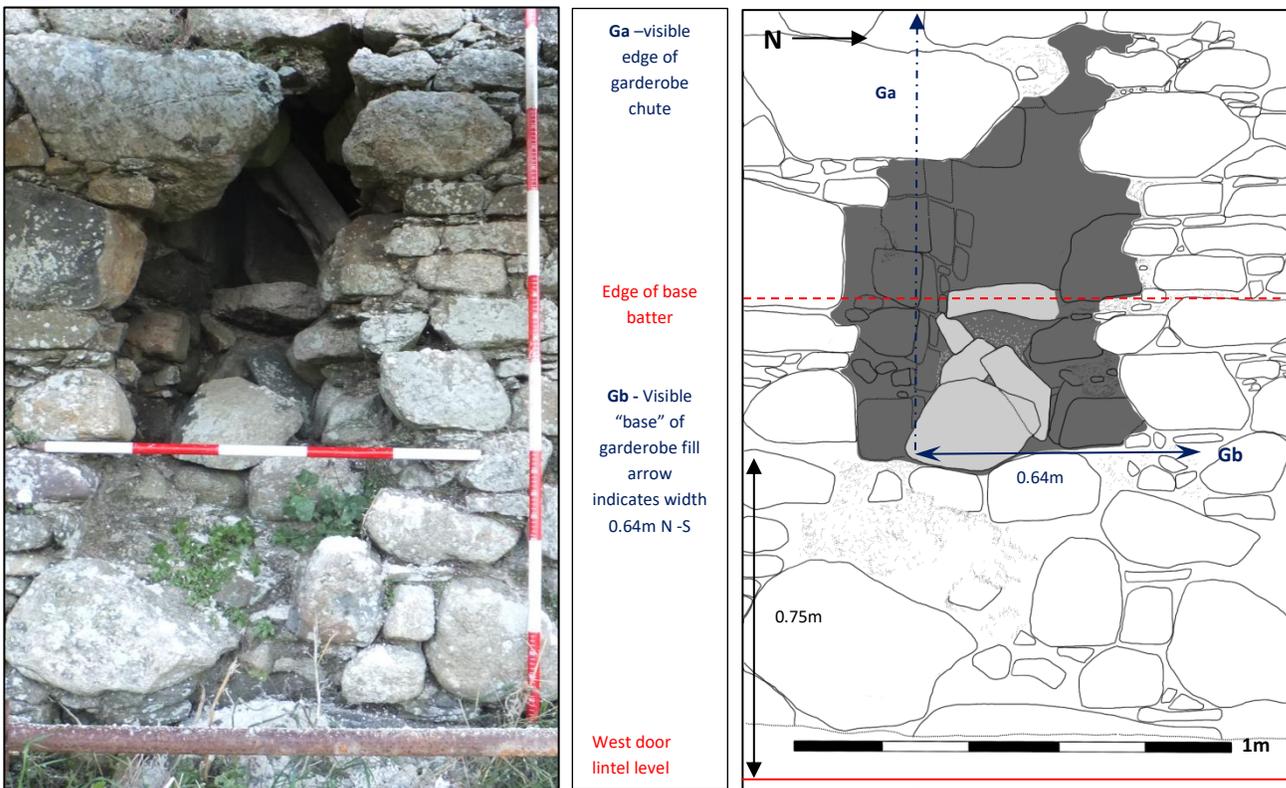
Scaled and Rectified photo of opening to garderobe chute.
